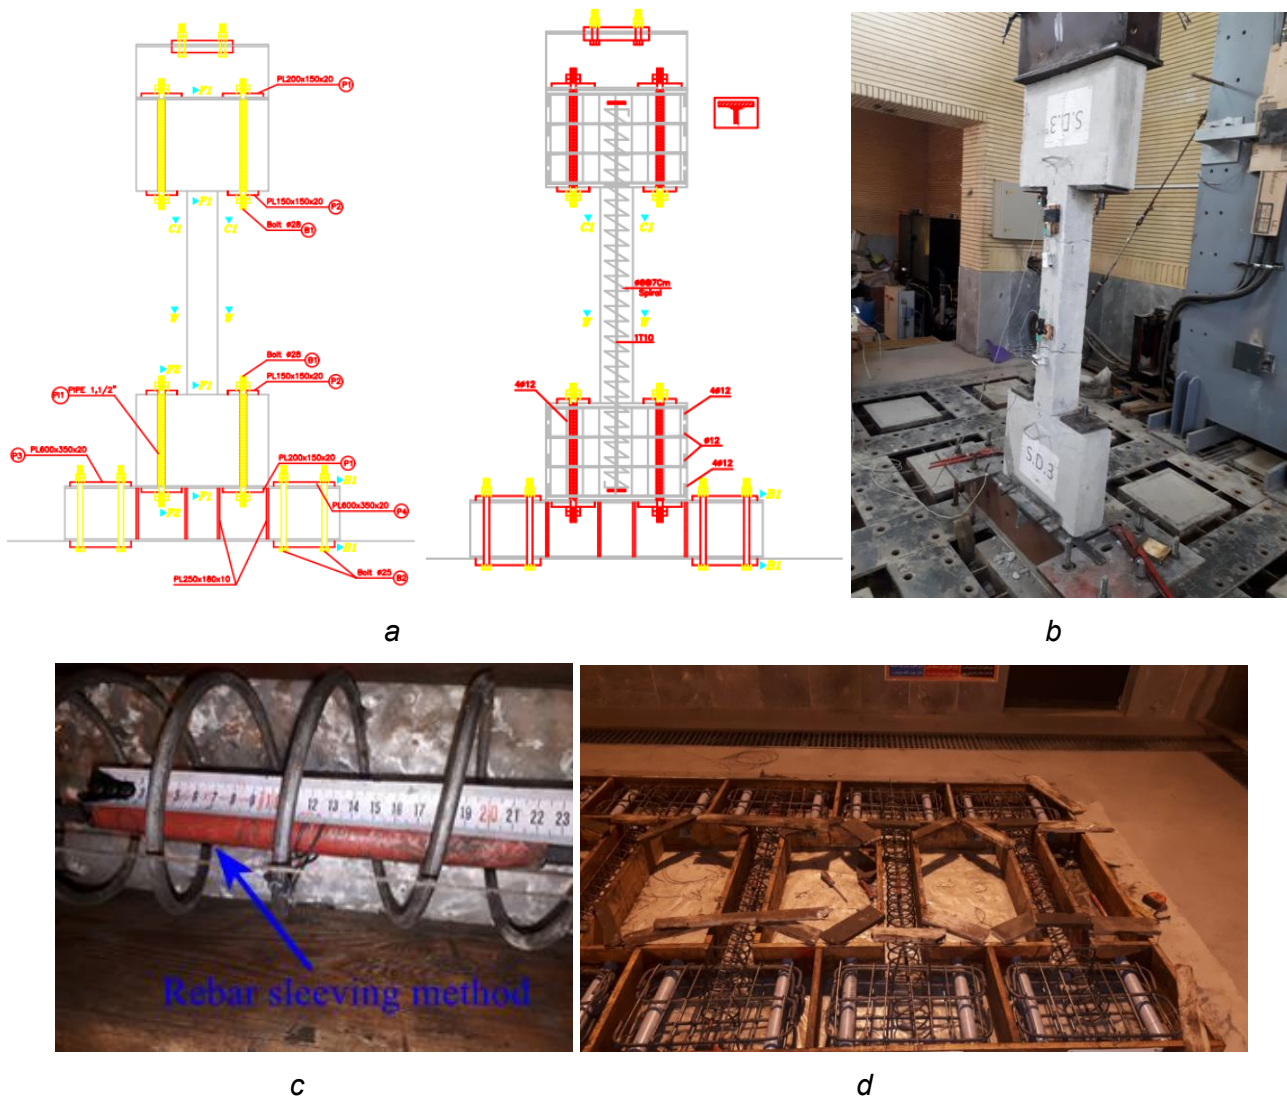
(a) Geometric properties of samples under study; (b) experimental setup and method of samples installing; (c) rebar sleeving method; (d) reinforcement and construction details of concrete boundary element before concrete placement
